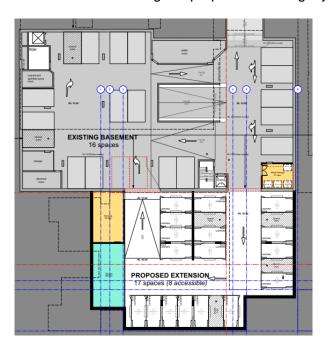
Basement Car Park Extension connecting to the existing Car Park serving the Church
